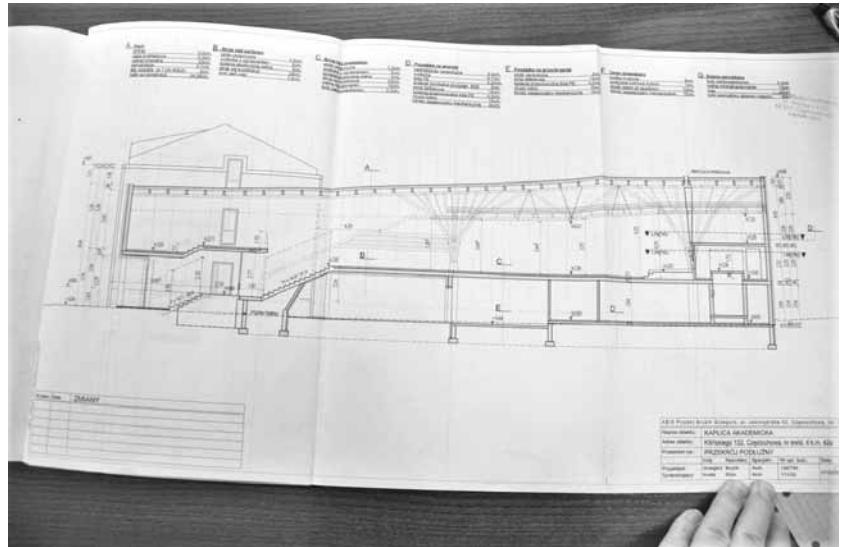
Academic church - longitudinal section (Source: architectural design of the church by Grzegorz Bryzik)
